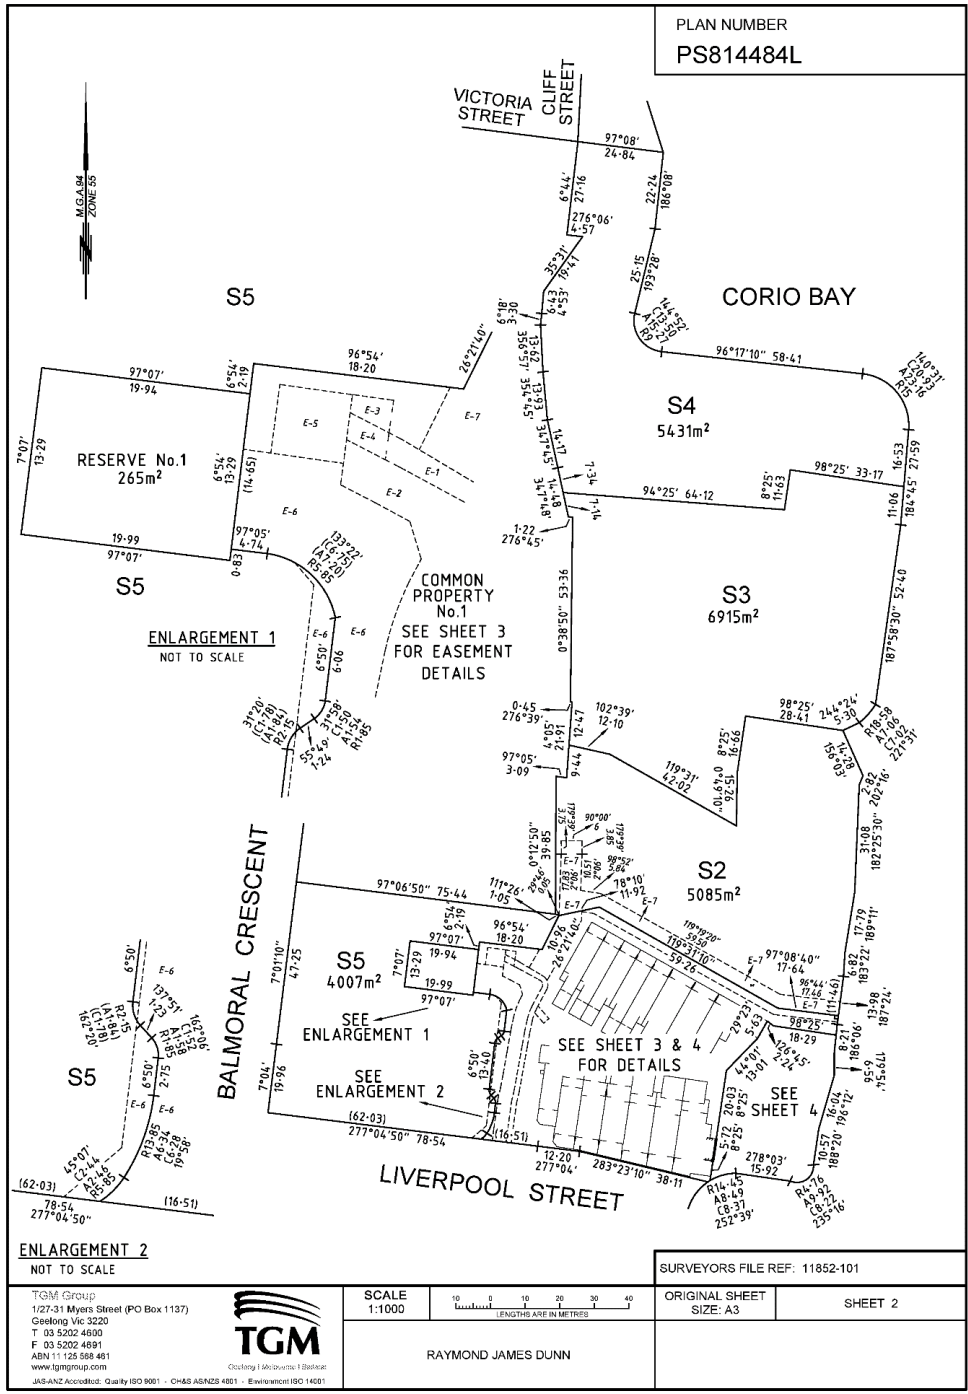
Plan of Subdivision showing Barwon Water Pump Station
